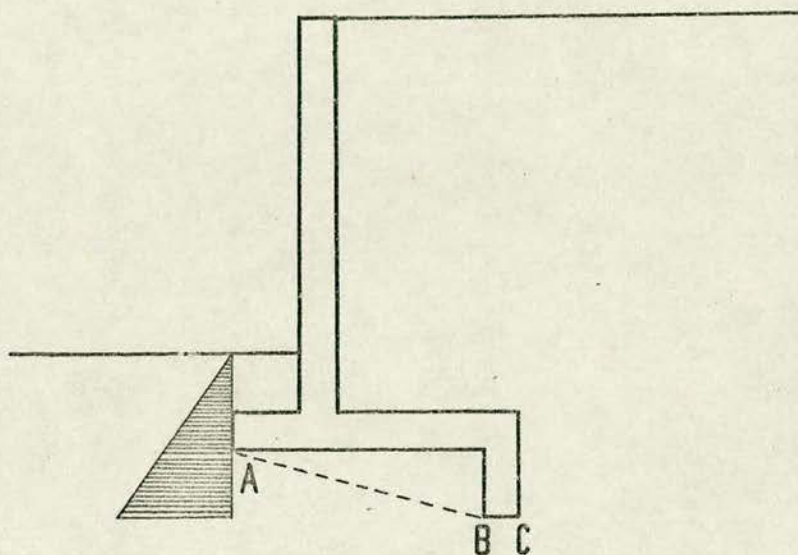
CANTILEVER WALL WITH HEEL KEY
